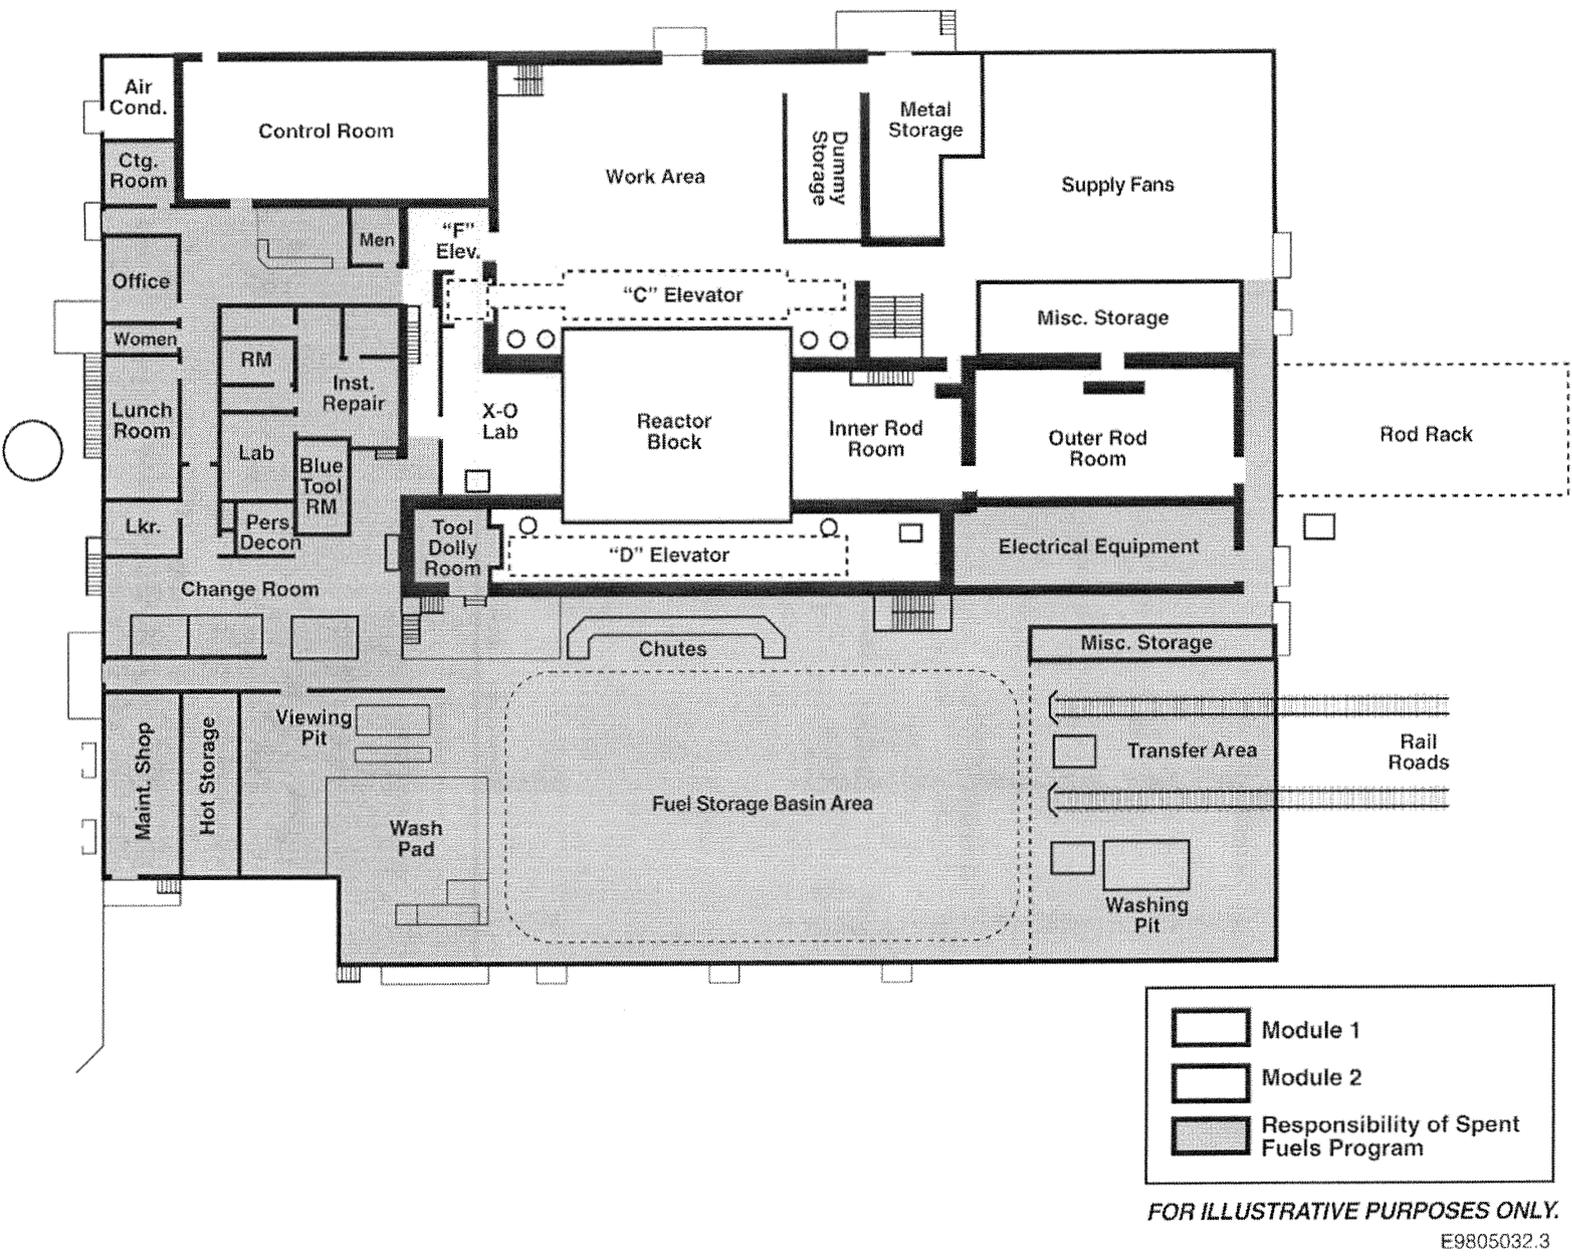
105-KW Reactor Building Plan View at Ground Level.
